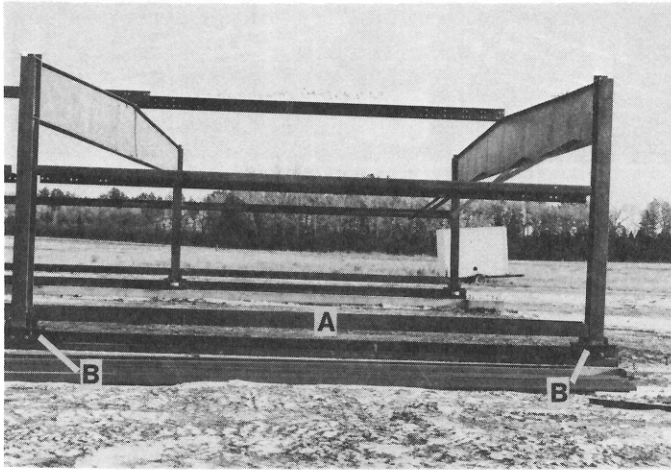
Steel and metal frame for rainout shelter structure. (A-I-beam for added strength; and B-columns directly welded to roller mechanism housing)
